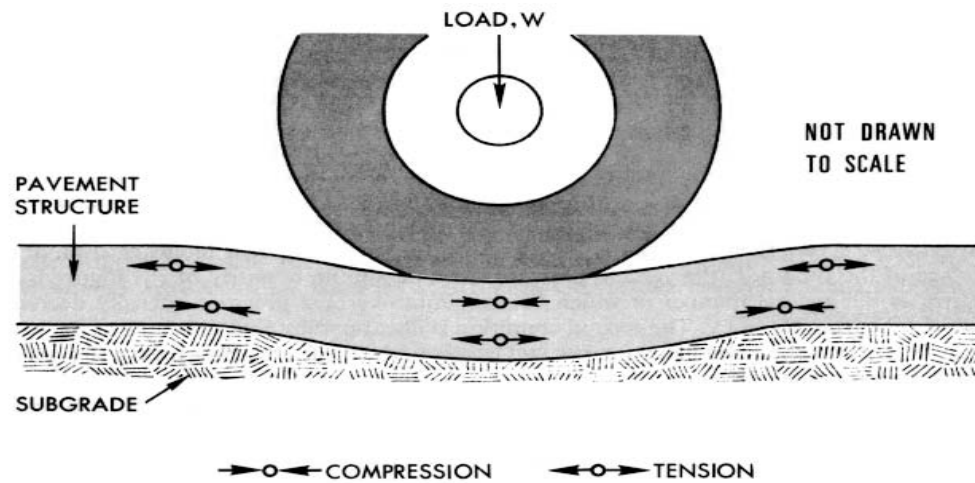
Typical stress states in asphalt concrete layers with loading (Santucci, 1998)
